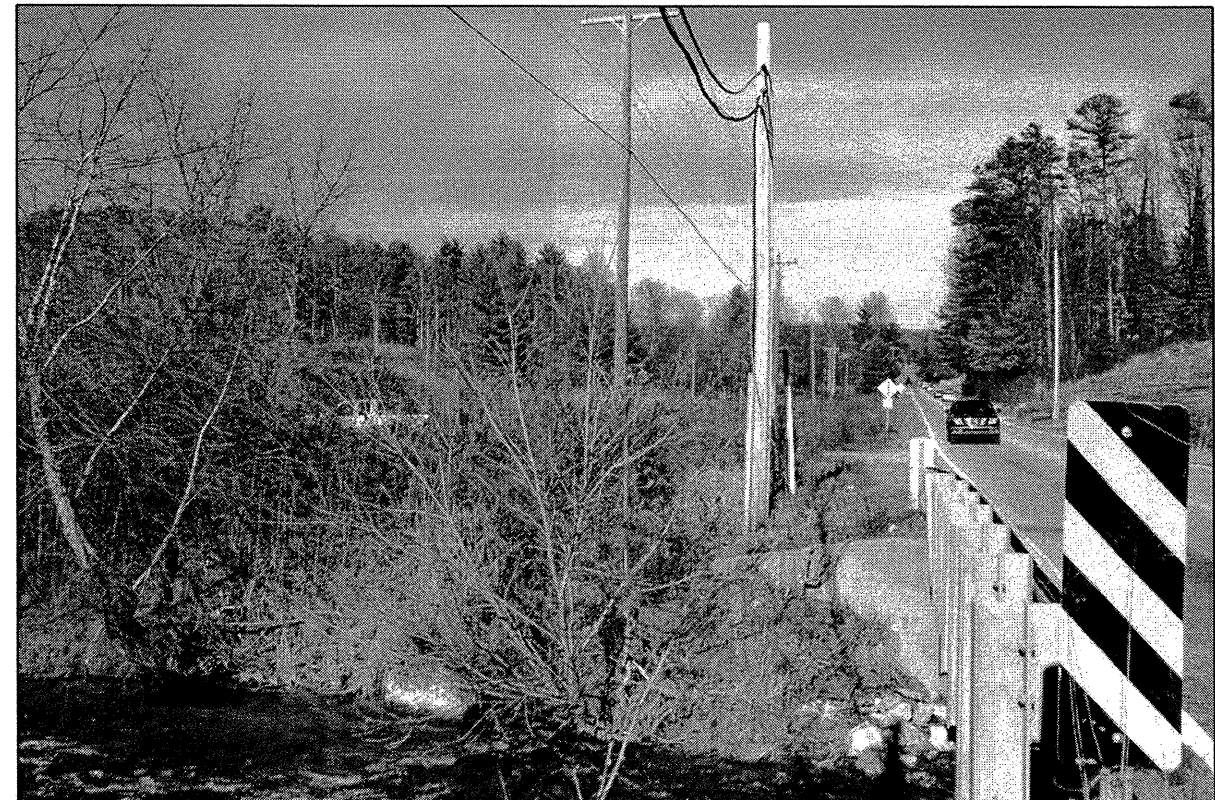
PHOTO TAKEN STANDING NEAR B1-B LOOKING UPSTATION TOWARD BENT 2.
